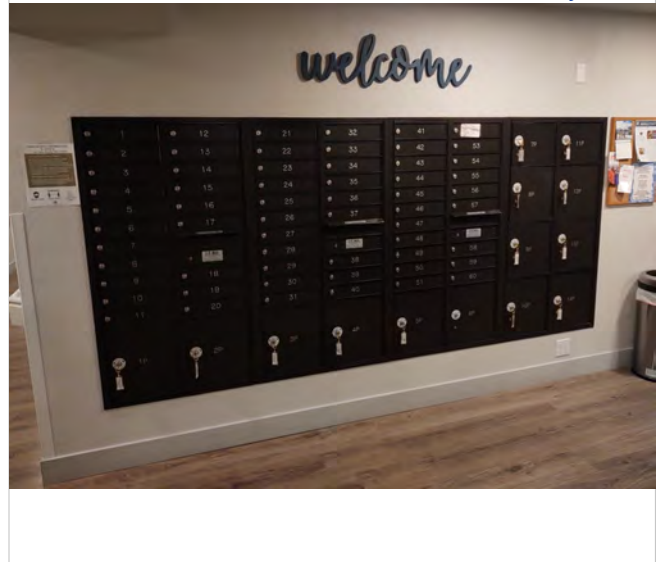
Measured height of 69 ½” to top of mailbox bank.
